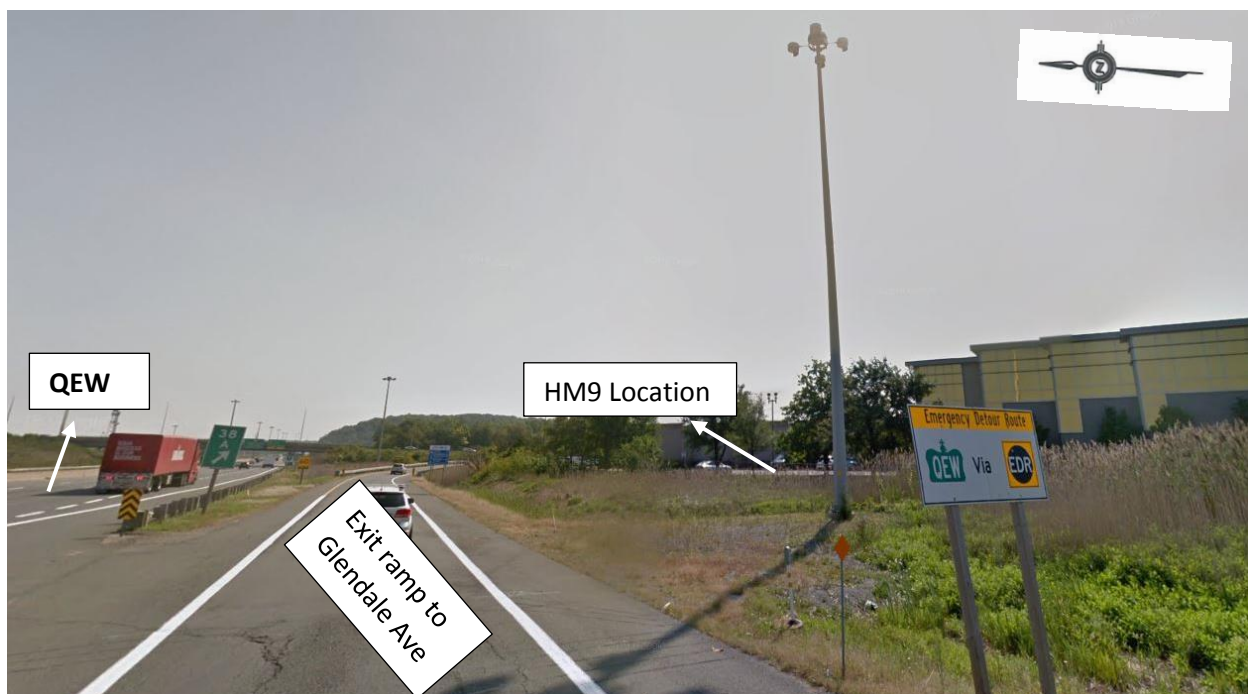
Looking towards East: HM9 Location at Exit 38A (June 2019)
